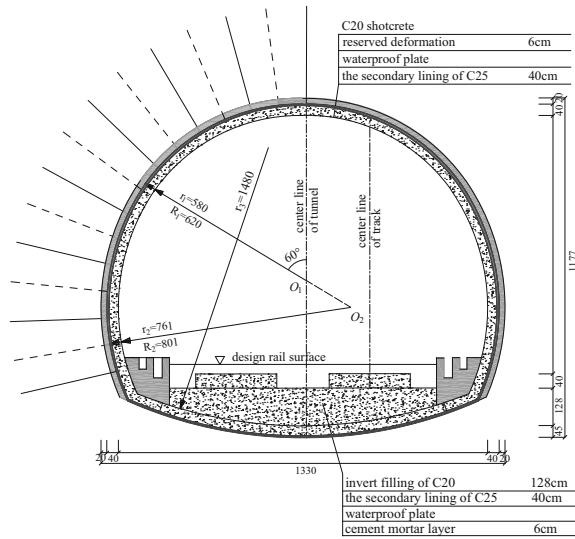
Cross section of Yunding tunnel (Grade III, unit: cm).
